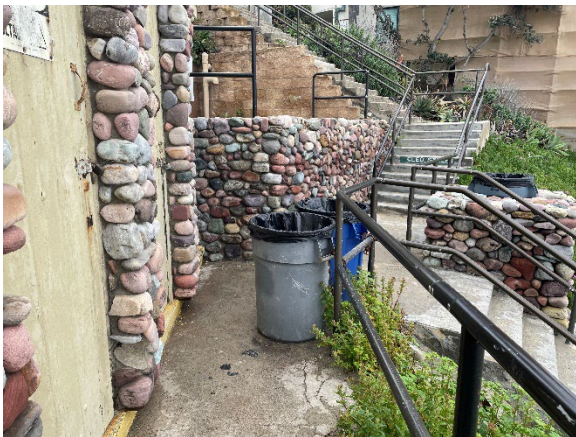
View of Cleo Street beach access stair, looking west (Stantec, March 2023)
